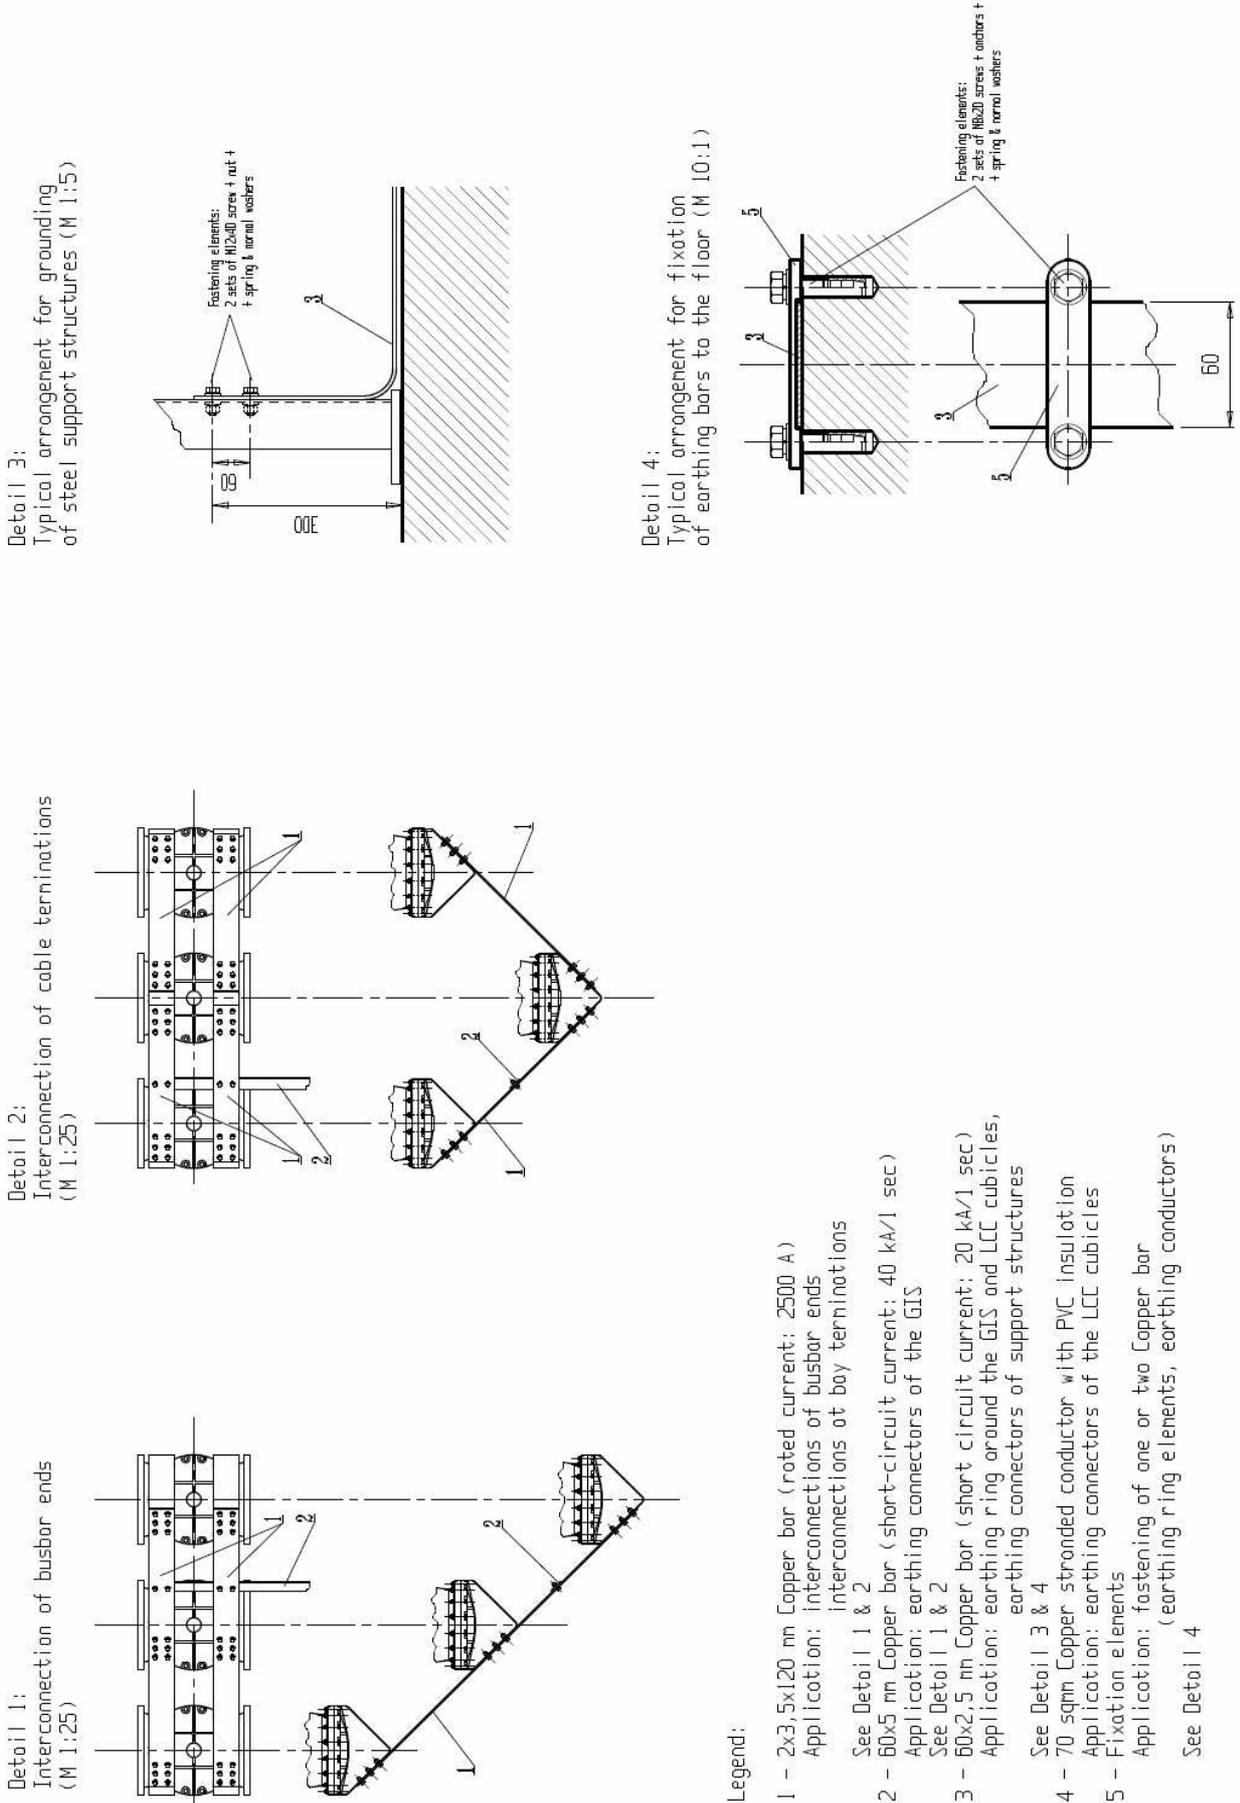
B: Earthing plane of BHILAI 220 kV GIS
